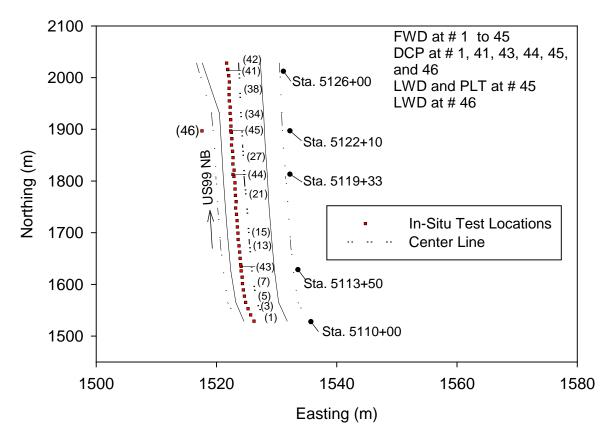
Test section plan layout with RTK GPS test points SH 99 Seminole County, Oklahoma
